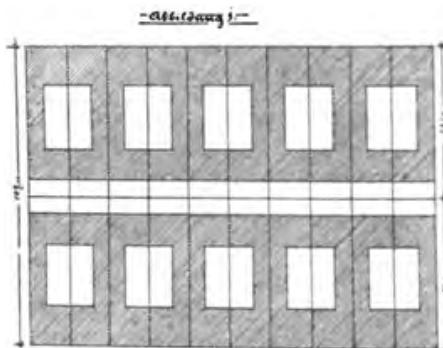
Perimeter block construction typical of the Hobrecht plan. From Theodor Goecke, "Verkehrsstraße und Wohnstraße" *Preussische Jahrbücher* 71, no. 1 (1893): 88
